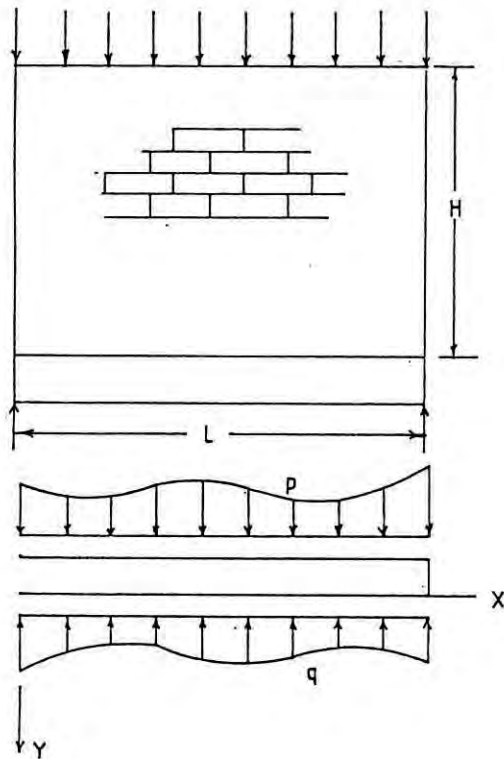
Wall-Beam as Beam on Elastic Foundations (Green)⁽¹⁸⁾
